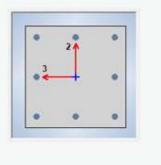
DESIGN OF STRUCTURAL ELEMENTS
